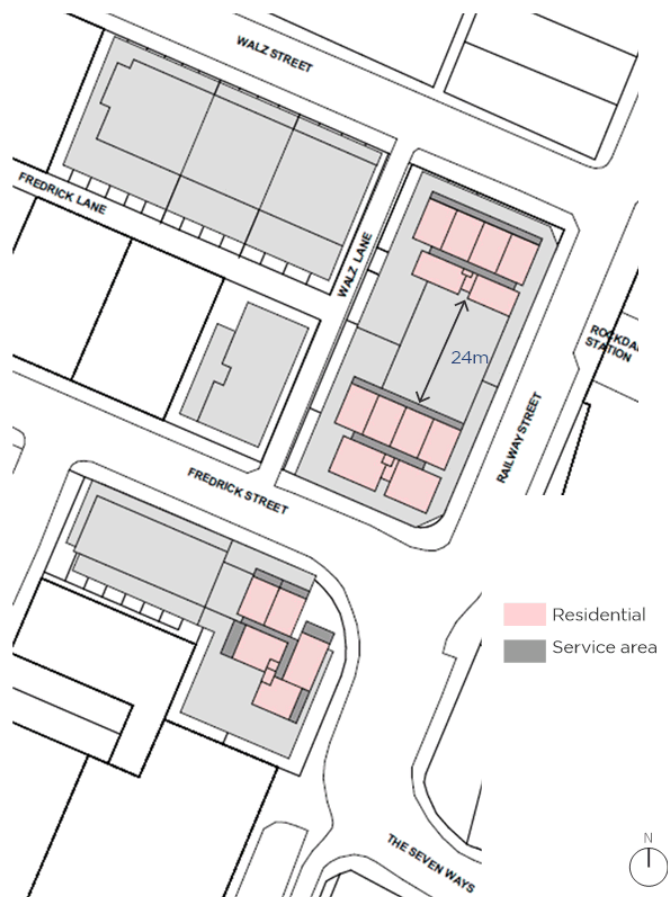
TYPICAL FLOOR PLAN (8TH FLOOR)
